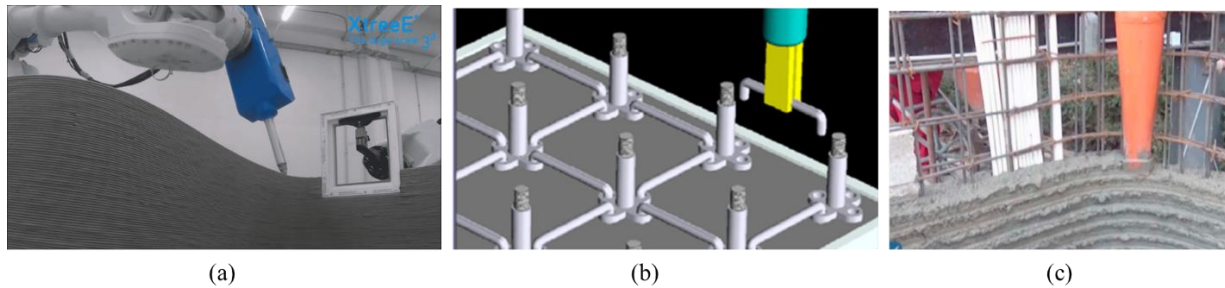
Automated contributory activities during printing process, (a) windows installation, (b) mechanical steel reinforcement connectors, and (c) steel mesh reinforcement.
